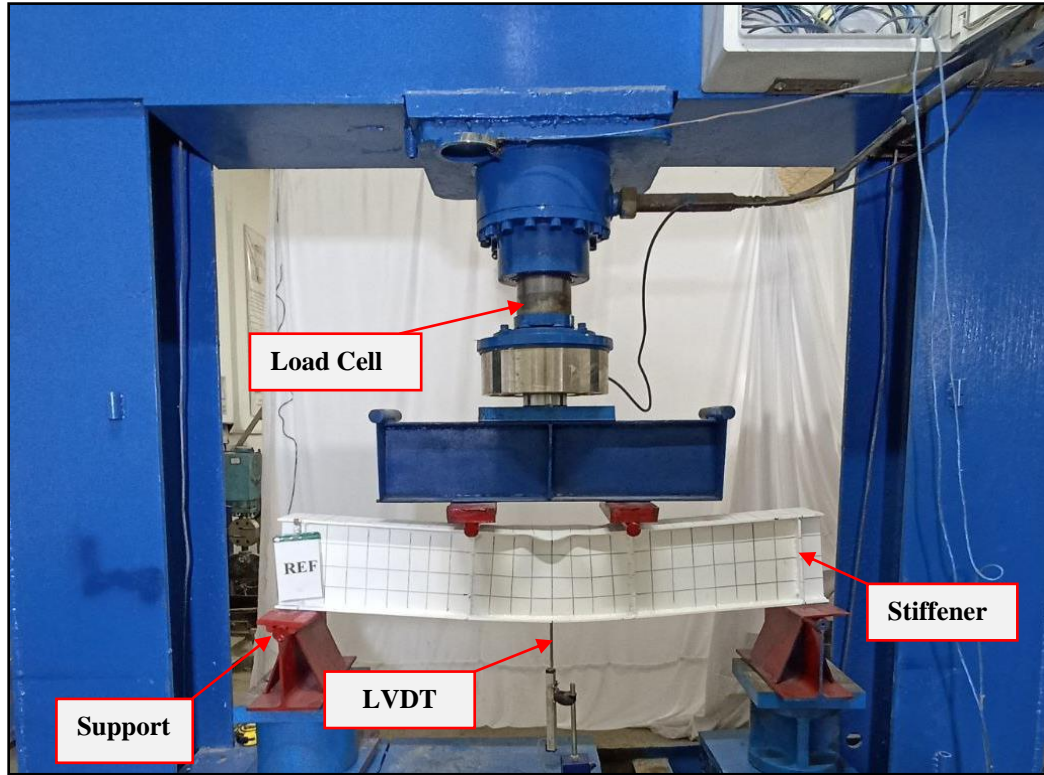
Hydraulic Testing Machine and Typical Details of the Test Setup.
